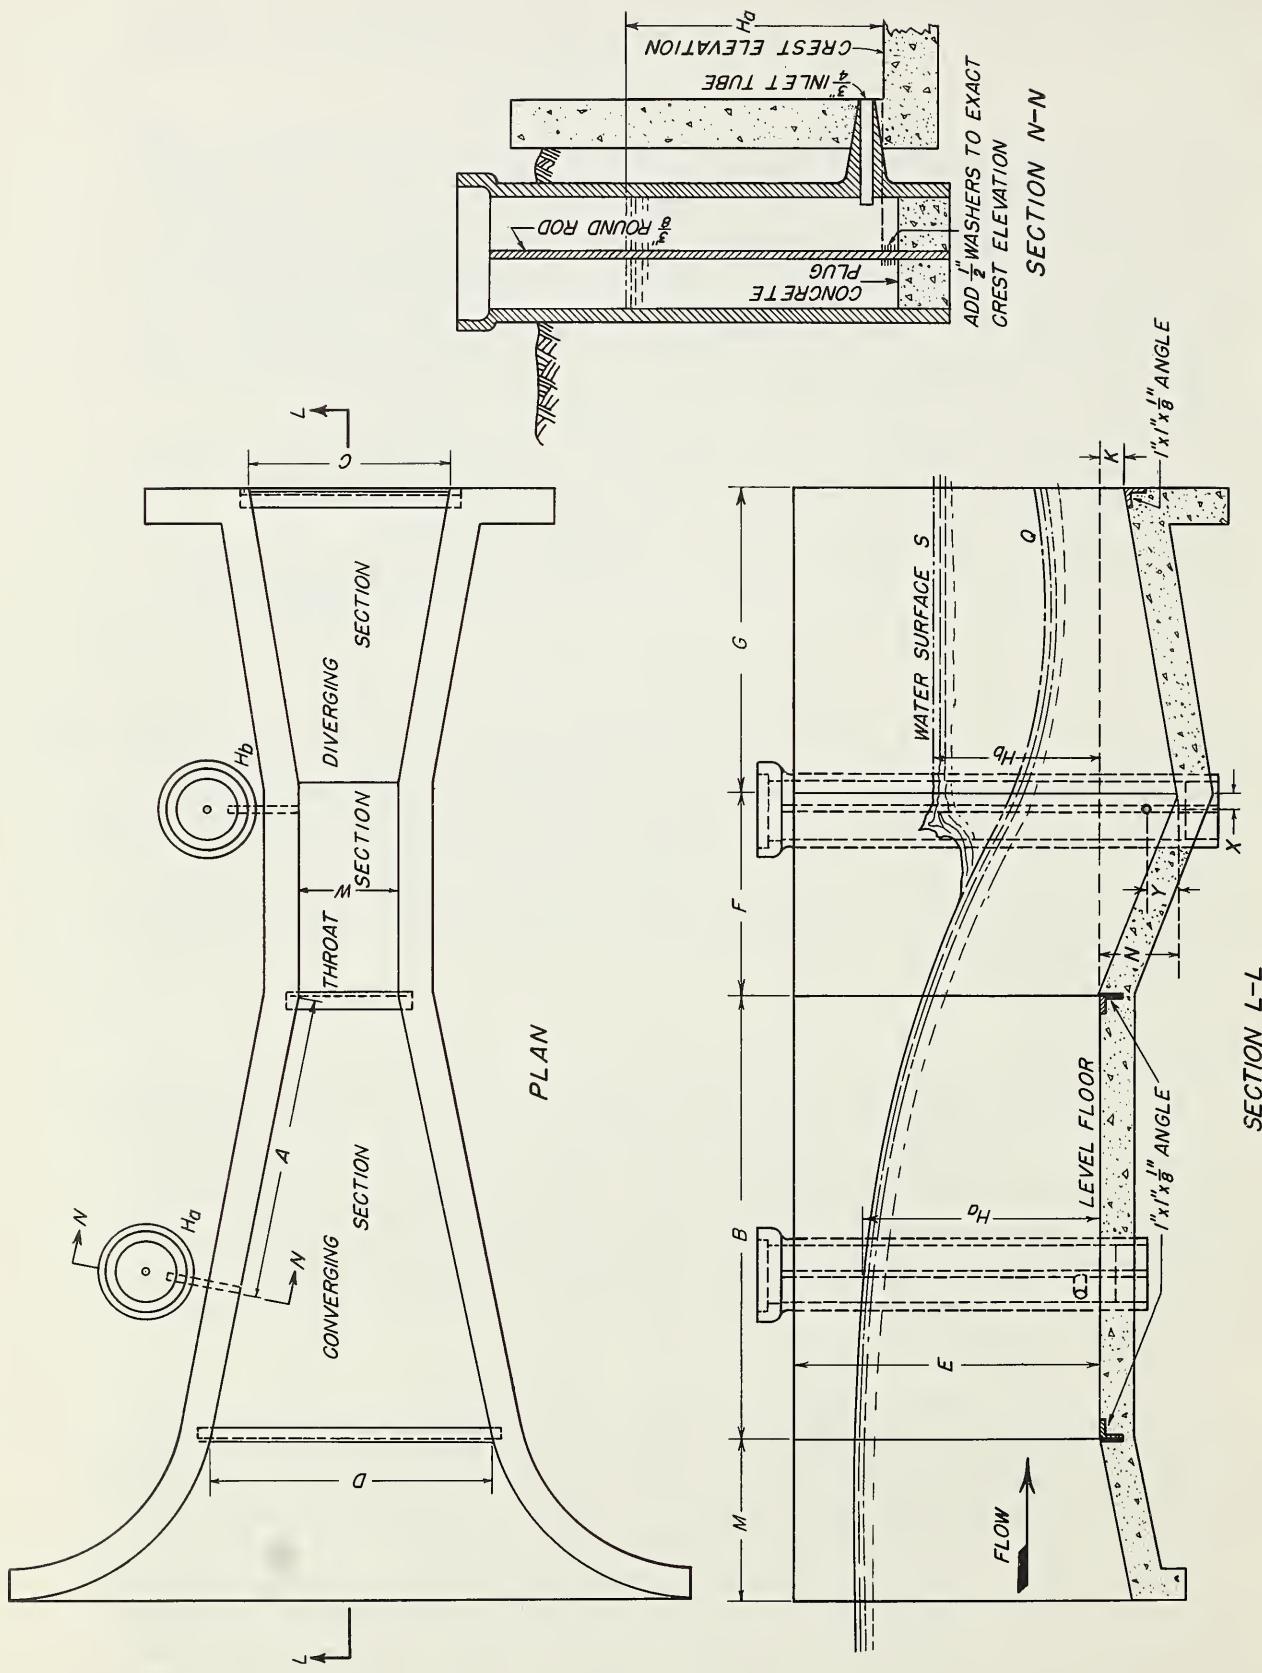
Plan and elevation of a concrete Parshall measuring flume showing component parts
